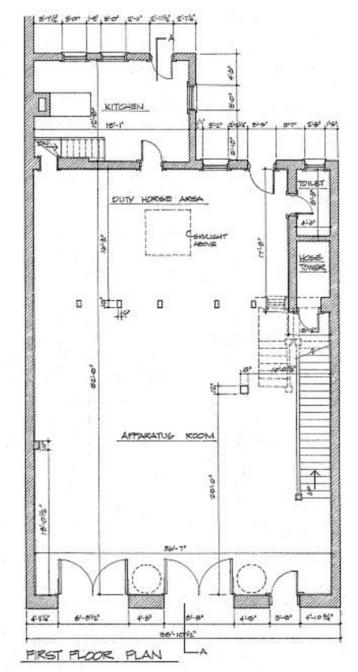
First Floor Plan of the Bank of Columbia, Historic American Buildings Survey, Library of Congress, HABS DC, GEO, 78 (sheet 2 of 6).
